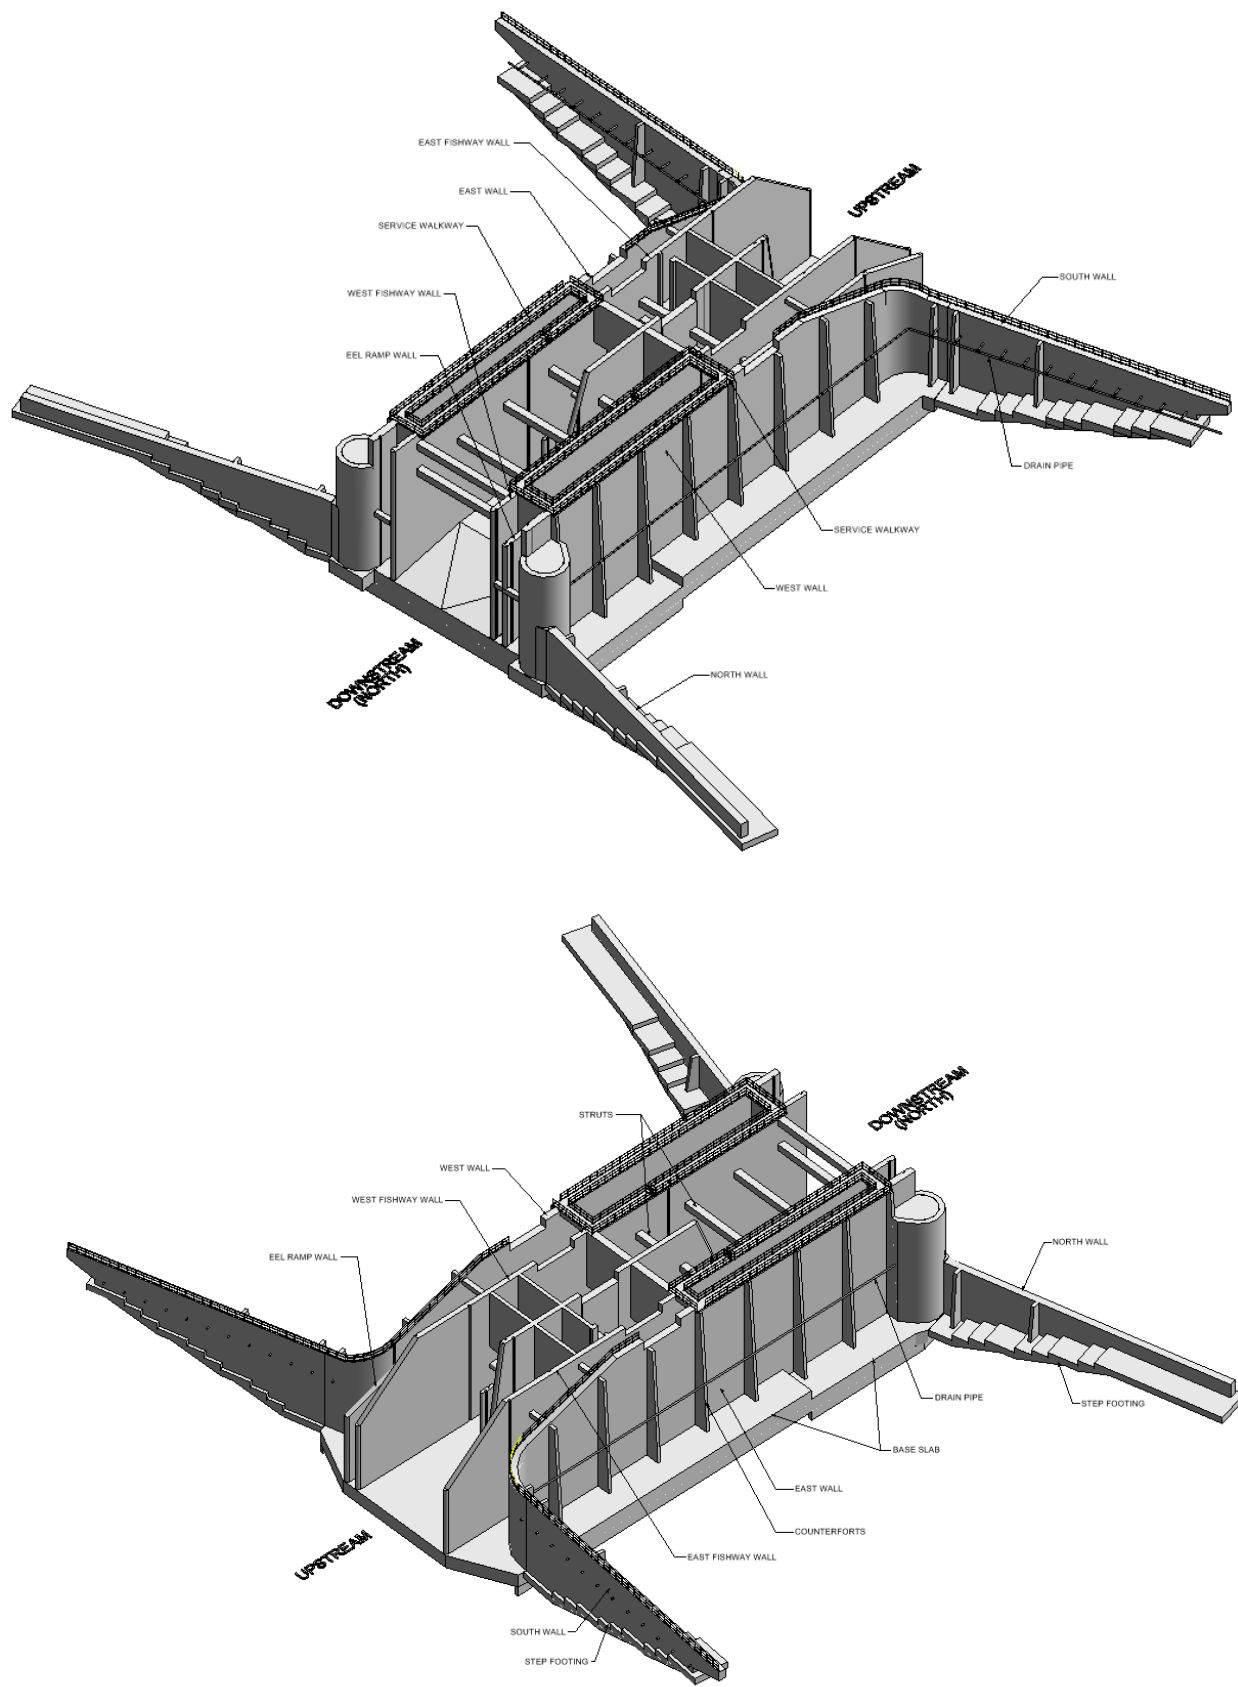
Conceptual Rendering of the New Aboiteau Structure.
